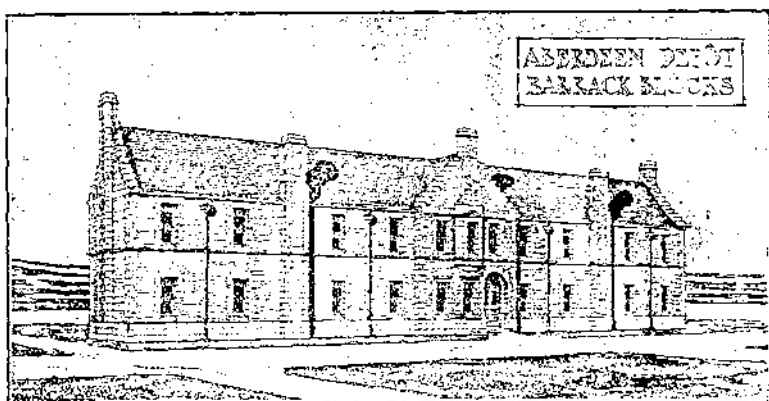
Design for Barrack Block, Aberdeen Depot.
